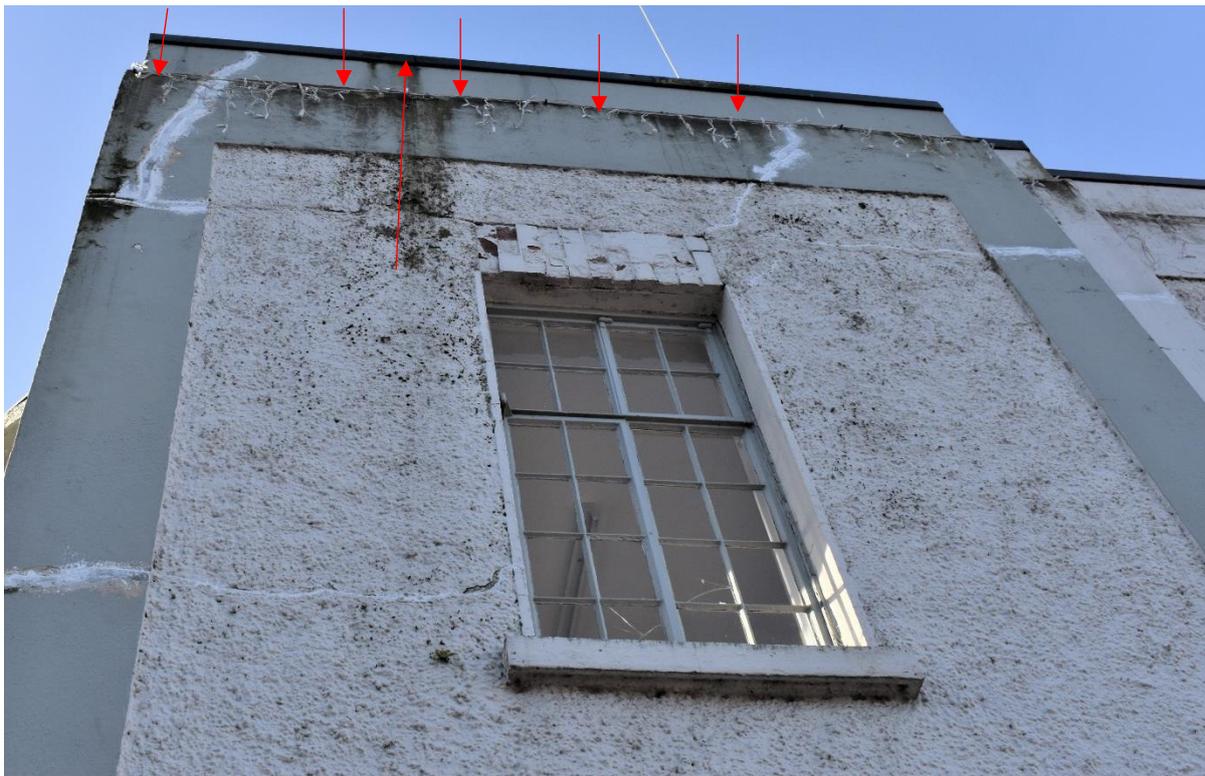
Showing the horizontal step and note the staining due to the flashing spilling onto the plaster. The wall is damp inside this location.
